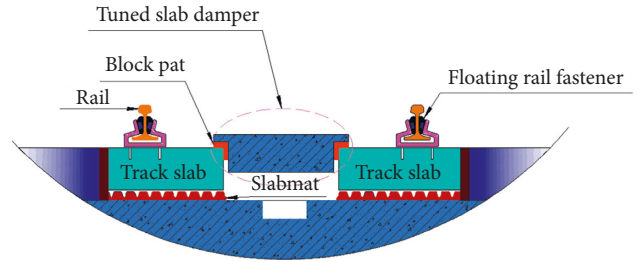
Structure of the fastener/tuned slab damper/floating slab.
